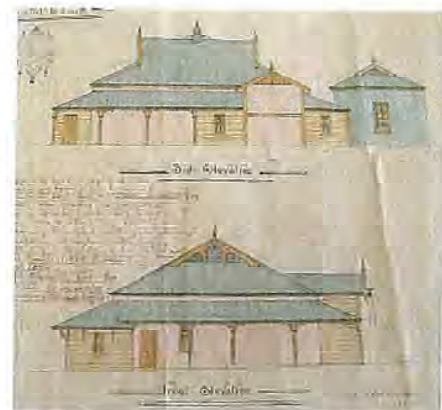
Front and side elevation of Bathurst butter factory. J.J. Copeman 1902. (State Library of New South Wales)
